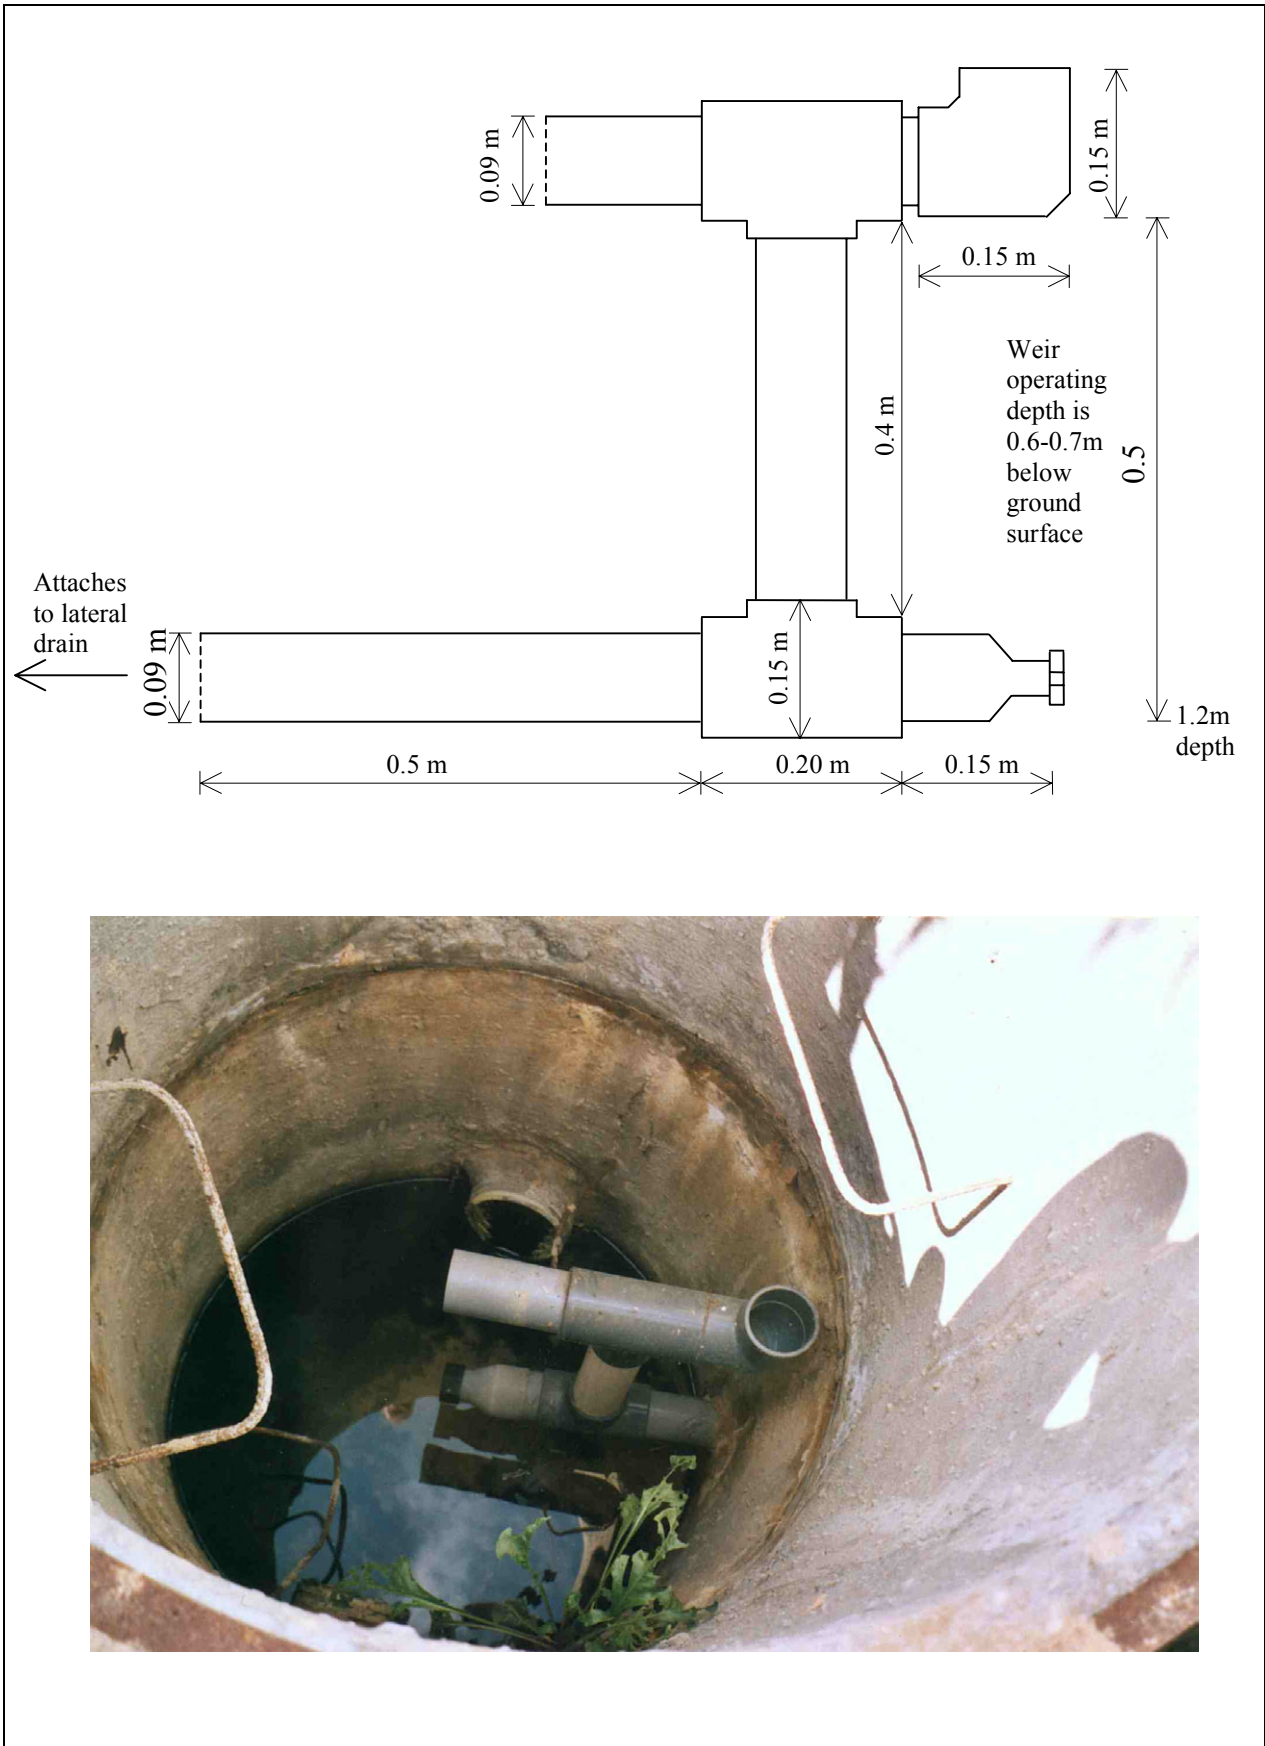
Prototype controlled drainage device, showing design details and location in subsurface drainage access manhole.
